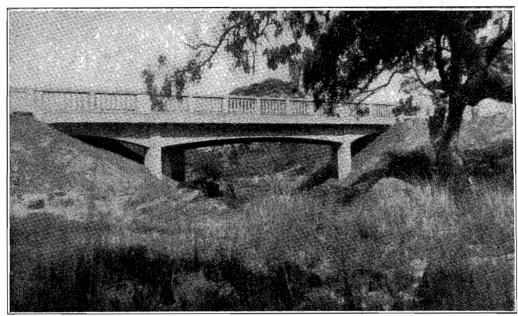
Little River bridge, near Ripley, Geelong-Bacchus Marsh Road.
